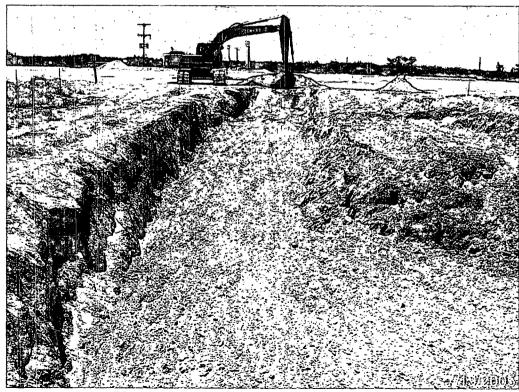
Looking at northwest corner of pit and clean dirt stockpile
